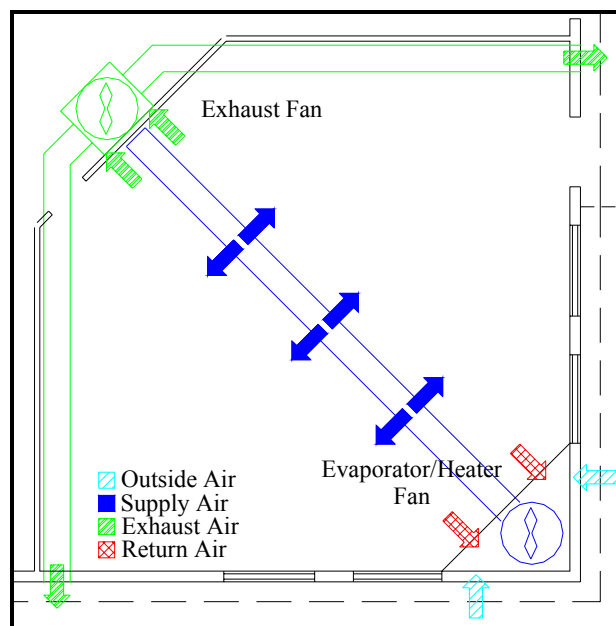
Hanna Ranch Classroom HVAC Equipment Layout.
